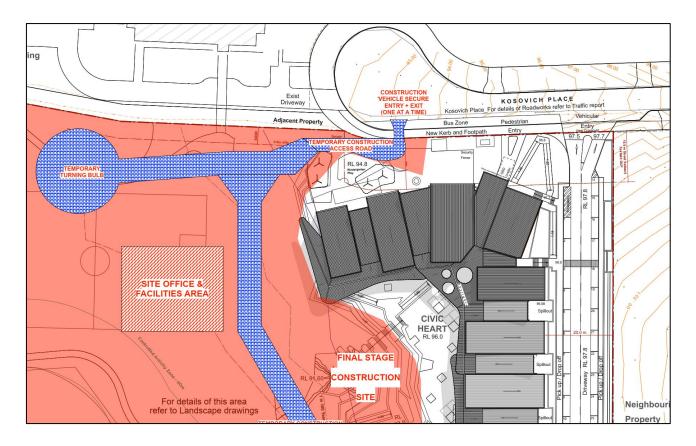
CONSTRUCTION ACCESS: FINAL DEVELOPMENT
